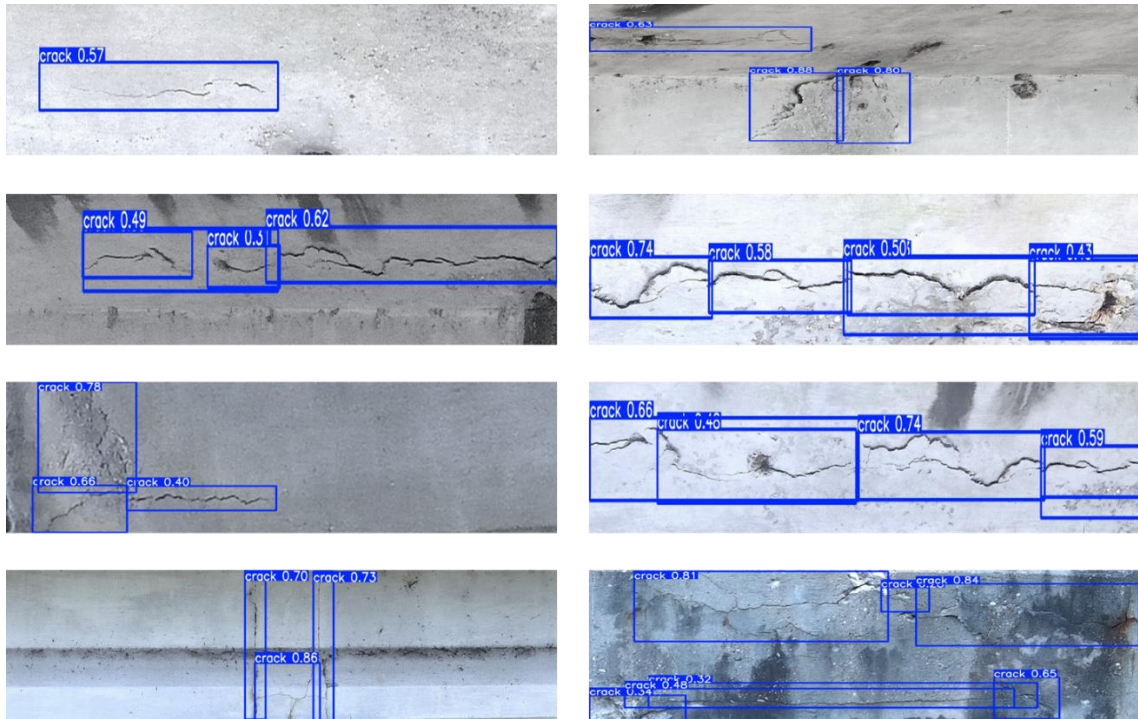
Cracks object detection for concrete surfaces of the bridges
